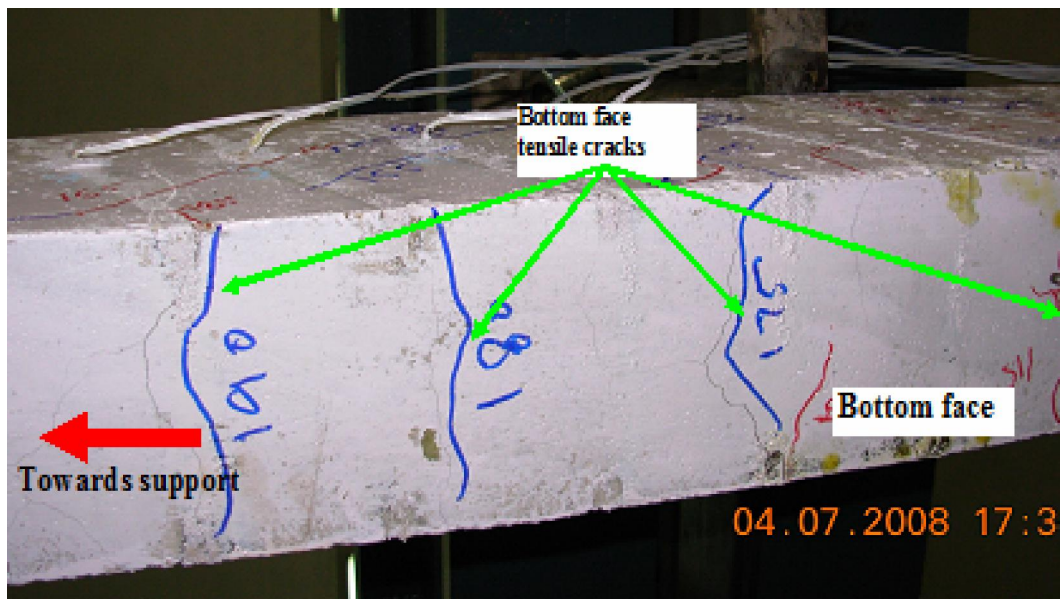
Test B1-SS final crack pattern at 200 kN (Bottom Face)
